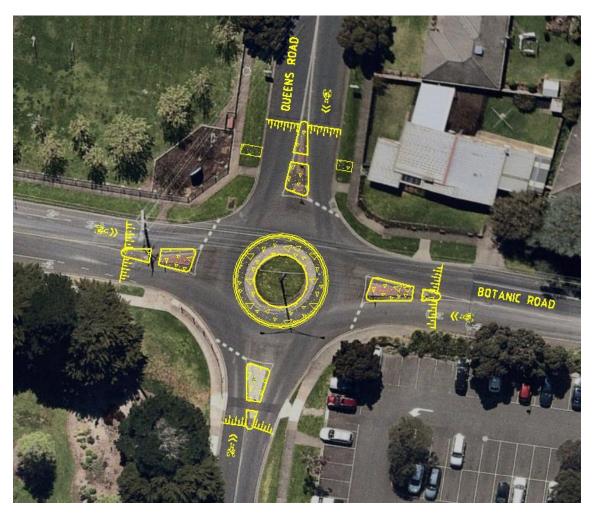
Botanic Road / Queens Road roundabout upgrade concept (note enlarged central island and splitter islands, raised pavement and sharrows)
